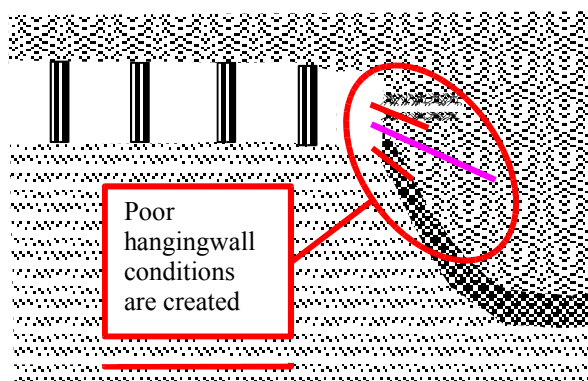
B: Continuous drilling into the hangingwall lavas while negotiating the roll creates poor hangingwall conditions.
